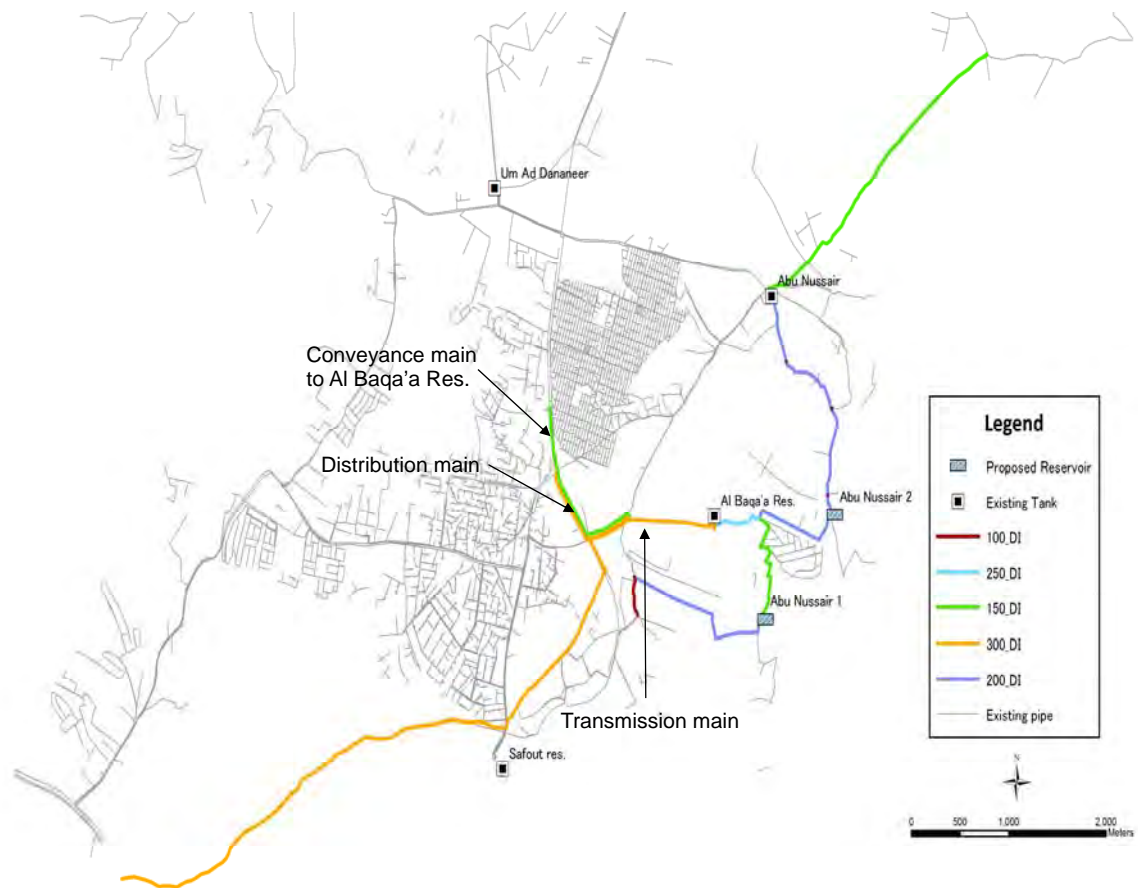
Arrangement of proposed pipeline routes and proposed facilities (Ain Al Basha)
